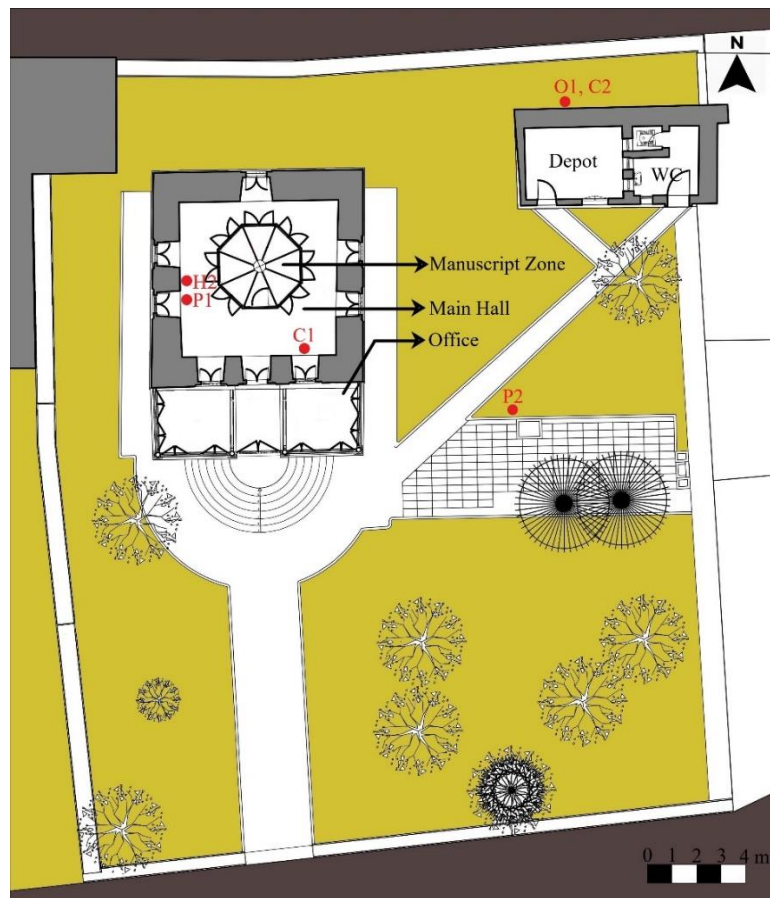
Locations of samplers, CO₂ loggers and dataloggers on the site plan
